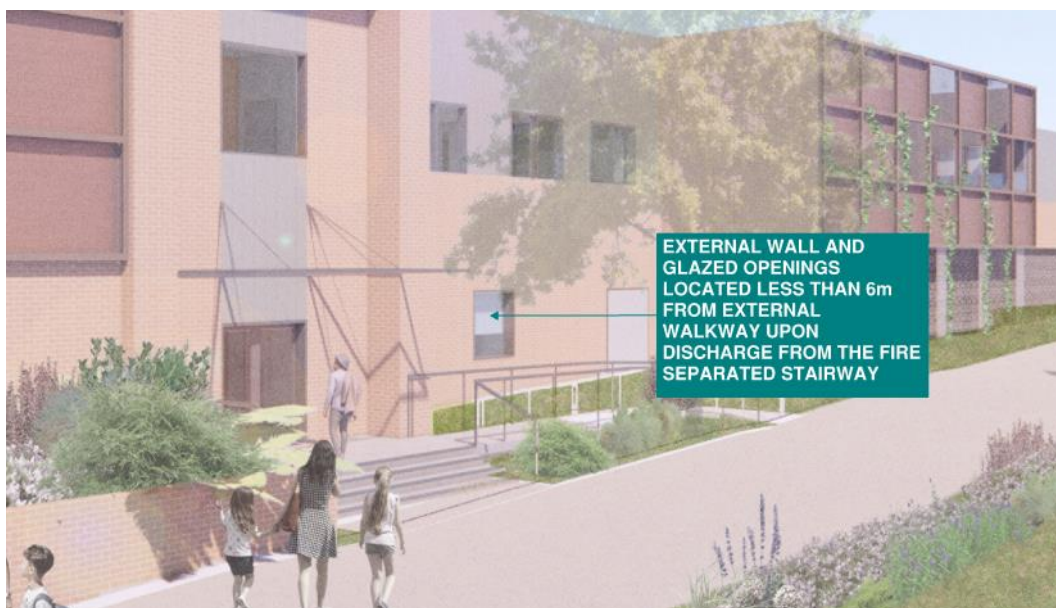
External pathway located within 6m of the external wall and openings to the Class 3 accommodation
